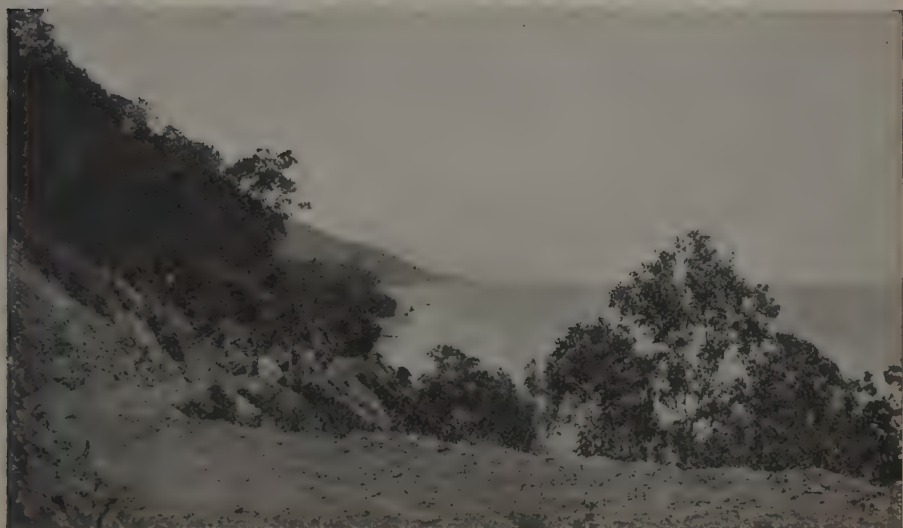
CAIRNS-PORT DOUGLAS ROAD UNDER CONSTRUCTION.
